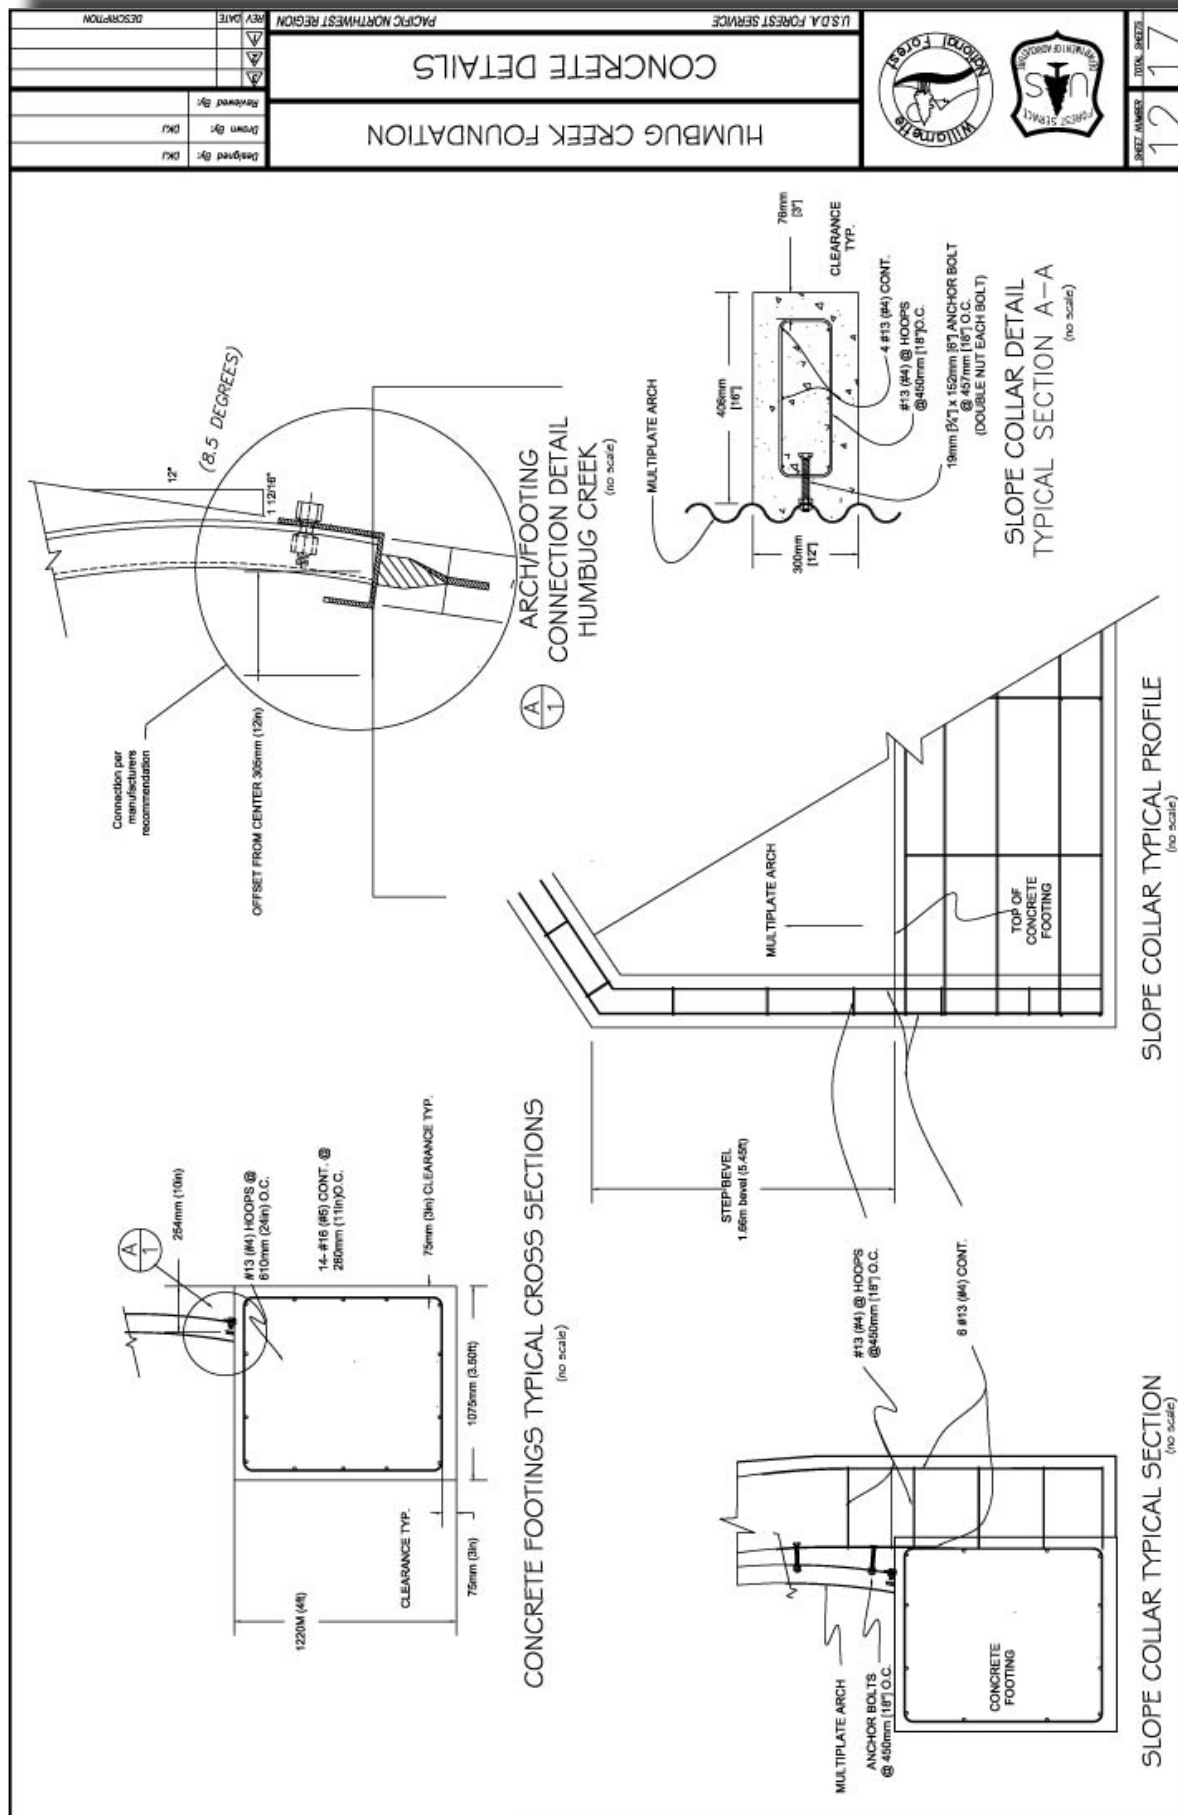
Humbug West Sheet 12 - Foundation Details.
